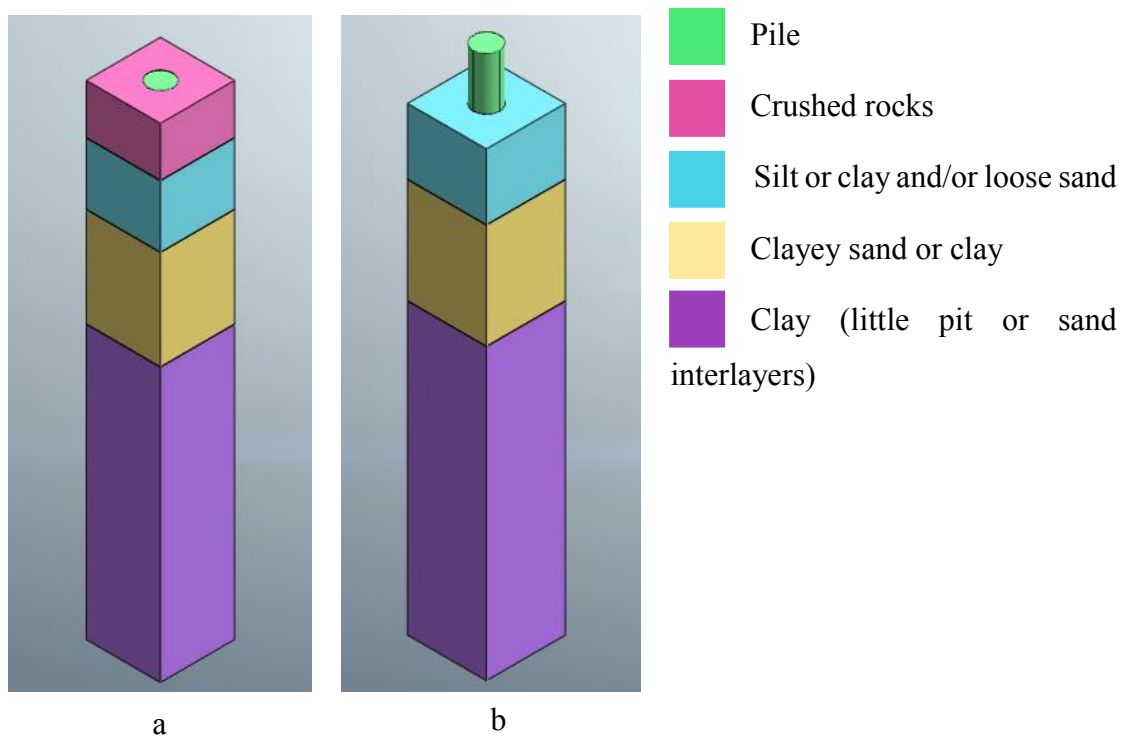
Model (a) complete soil and pile (b) pile in soil without a soil layer
